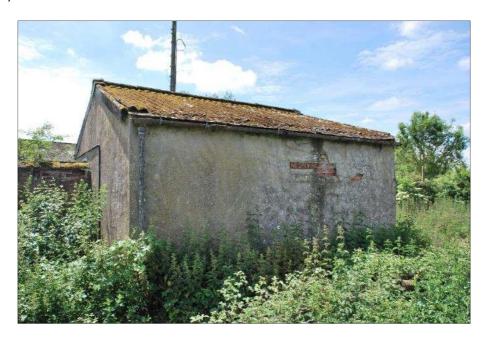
(Shot 27): North elevation of pumping station, looking southwest
